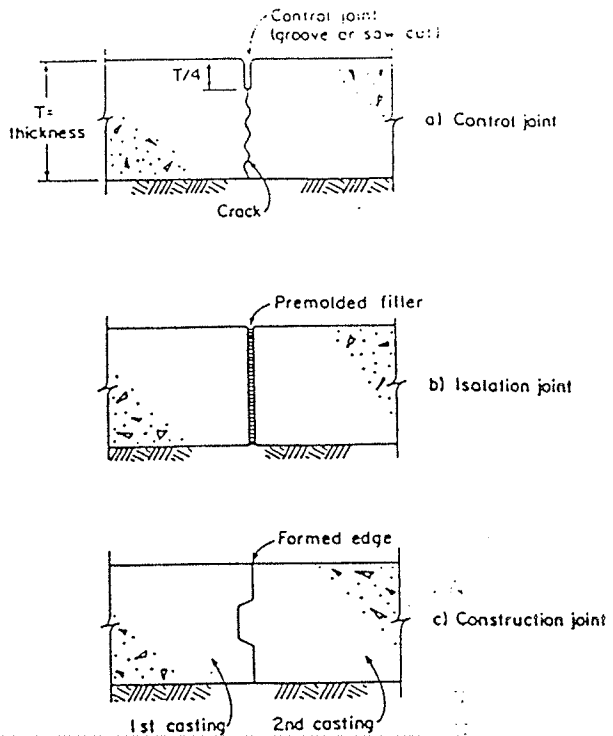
The three basic types of joints used in concrete slab-on-ground construction.
